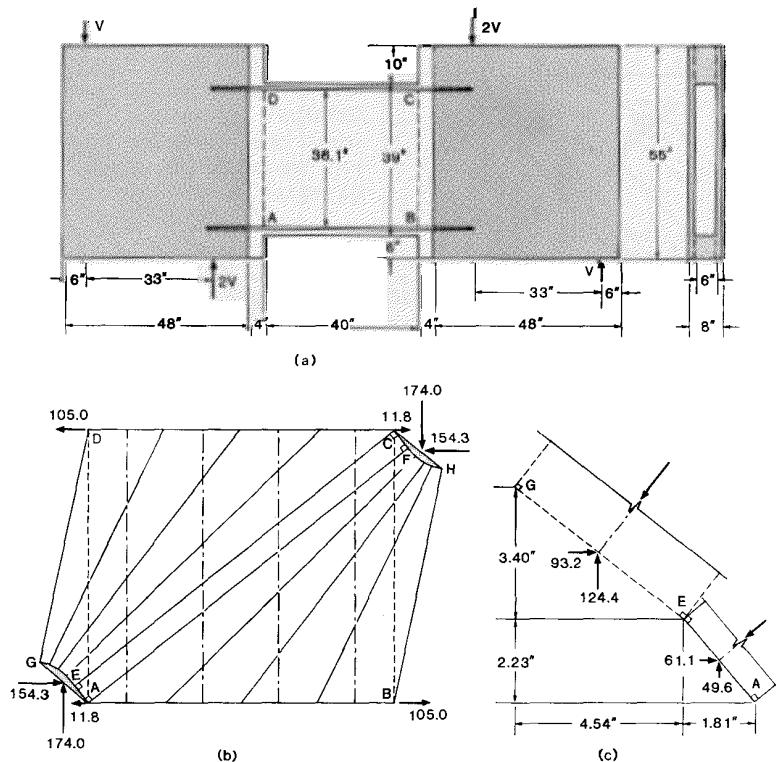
Combined strut and fan action: (a) Geometry and loading of Paulay's¹⁹ shearwall coupling beam No. 391 (1 in. = 25.4 mm); (b) Stress field and forces (1 kip = 4.45 kN); (c) Detail of nodal zone AEG
